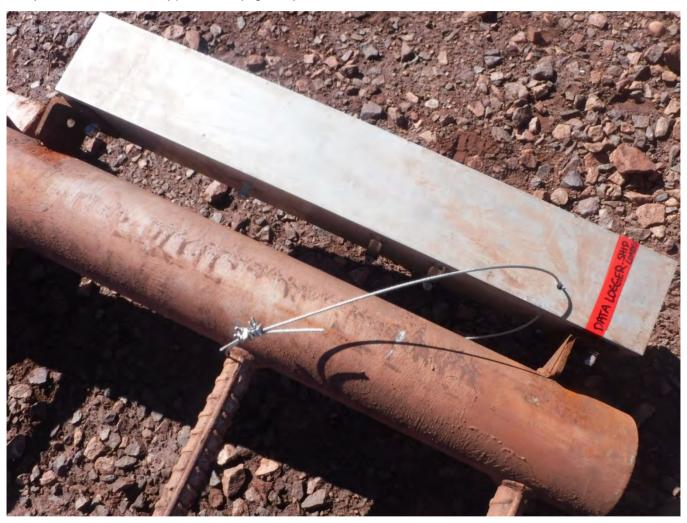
Hardware attaching aluminum tube to steel L brackets and wire rope for redundancy of the L bracket attachments.
